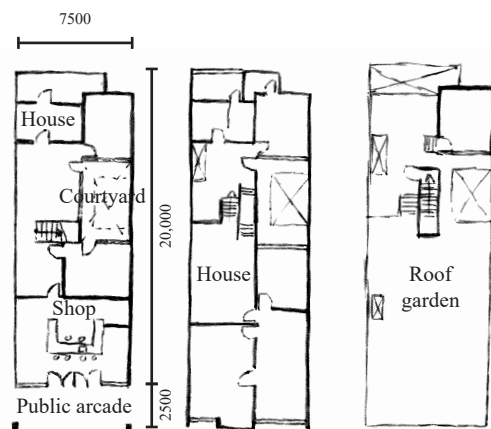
Floor plan contemporary shophouse (Siregar, 1990, P. 82)
